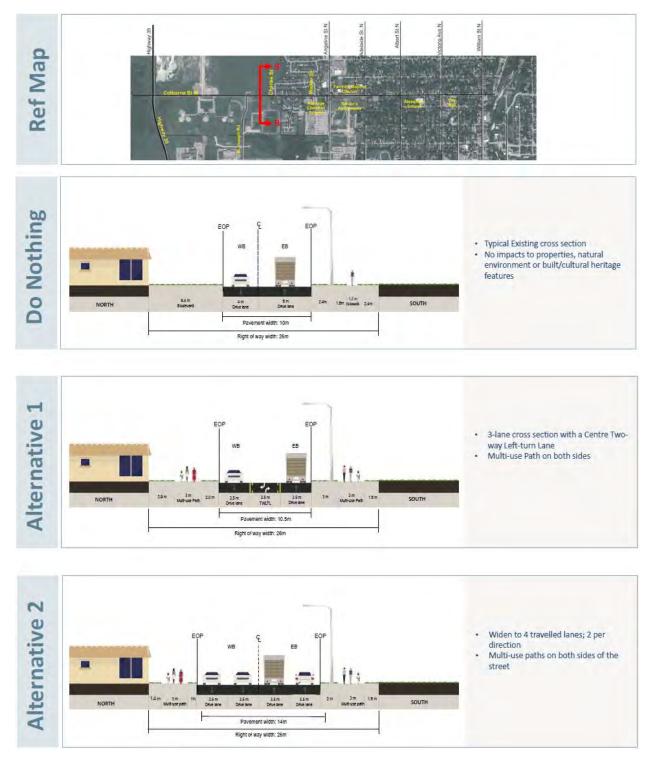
Segment B: Colborne Street - East of St. Joseph Road
